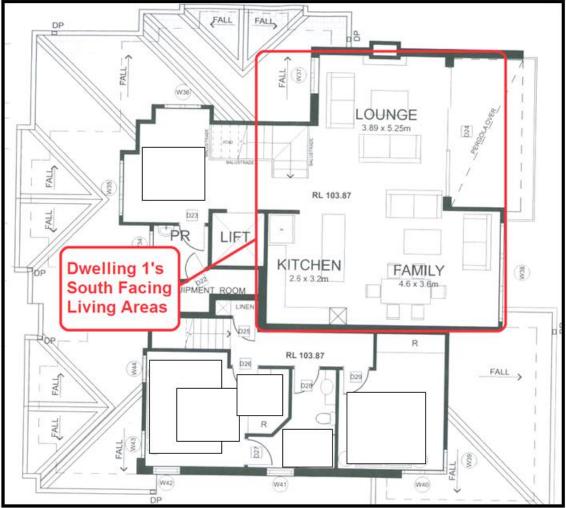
Image showing the first level floor plan of 9 Eric Street, Eastwood. The floor plan indicates the south facing living areas of dwelling 1.
